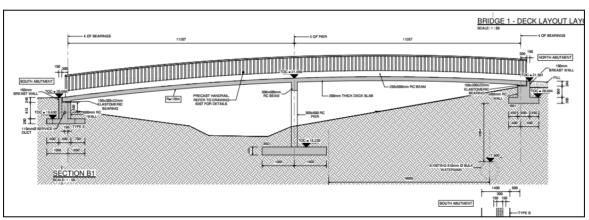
Bridge 1 Cross-section (source: Gibb, 2021)
